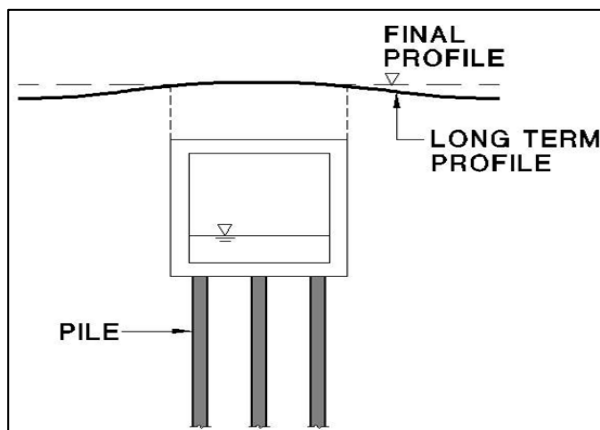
Culvert Founded on Pile Foundation (not recommended)
